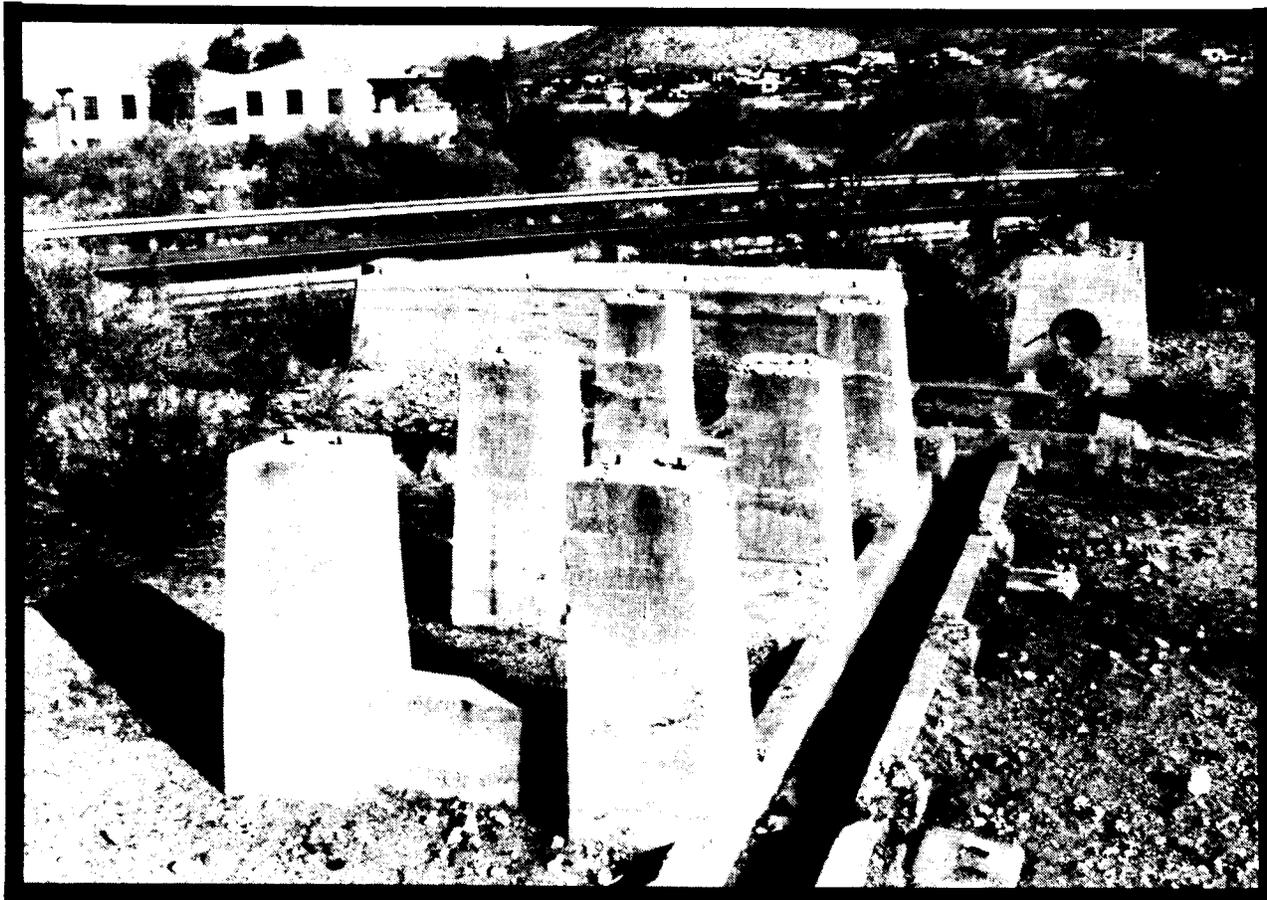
View of Features B (Condenser Unit), D (Concrete Trough System), I (Early Concrete Piers), and A and J (Rotary Kiln Support Platforms) at Mercury Ore Processing Plant, Locus 1 of Site AZ T:8:53 (ASM). View Northwest
